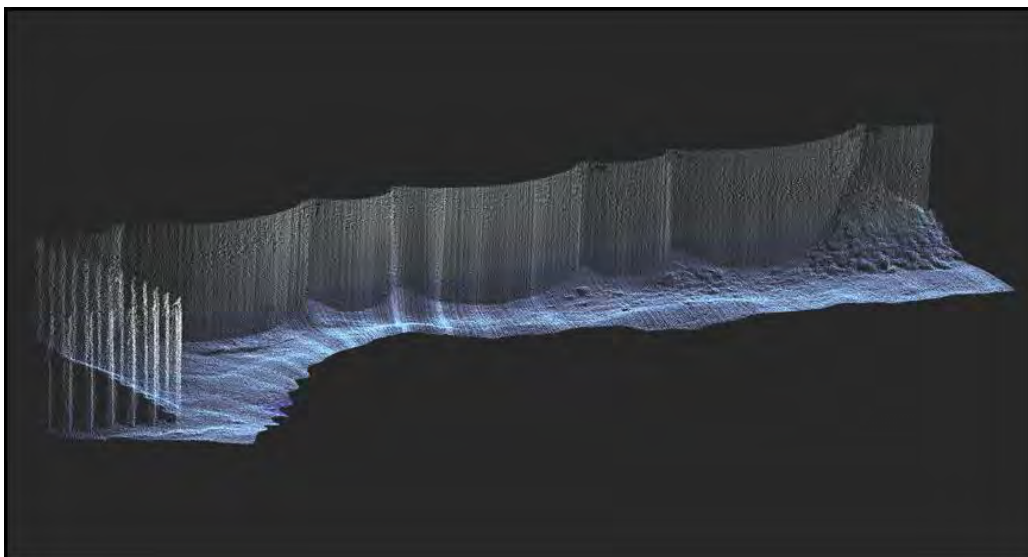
Multibeam steel sheet pile inspection at Milwaukee Harbor CDF. (Detroit District, Soo Area Office)
